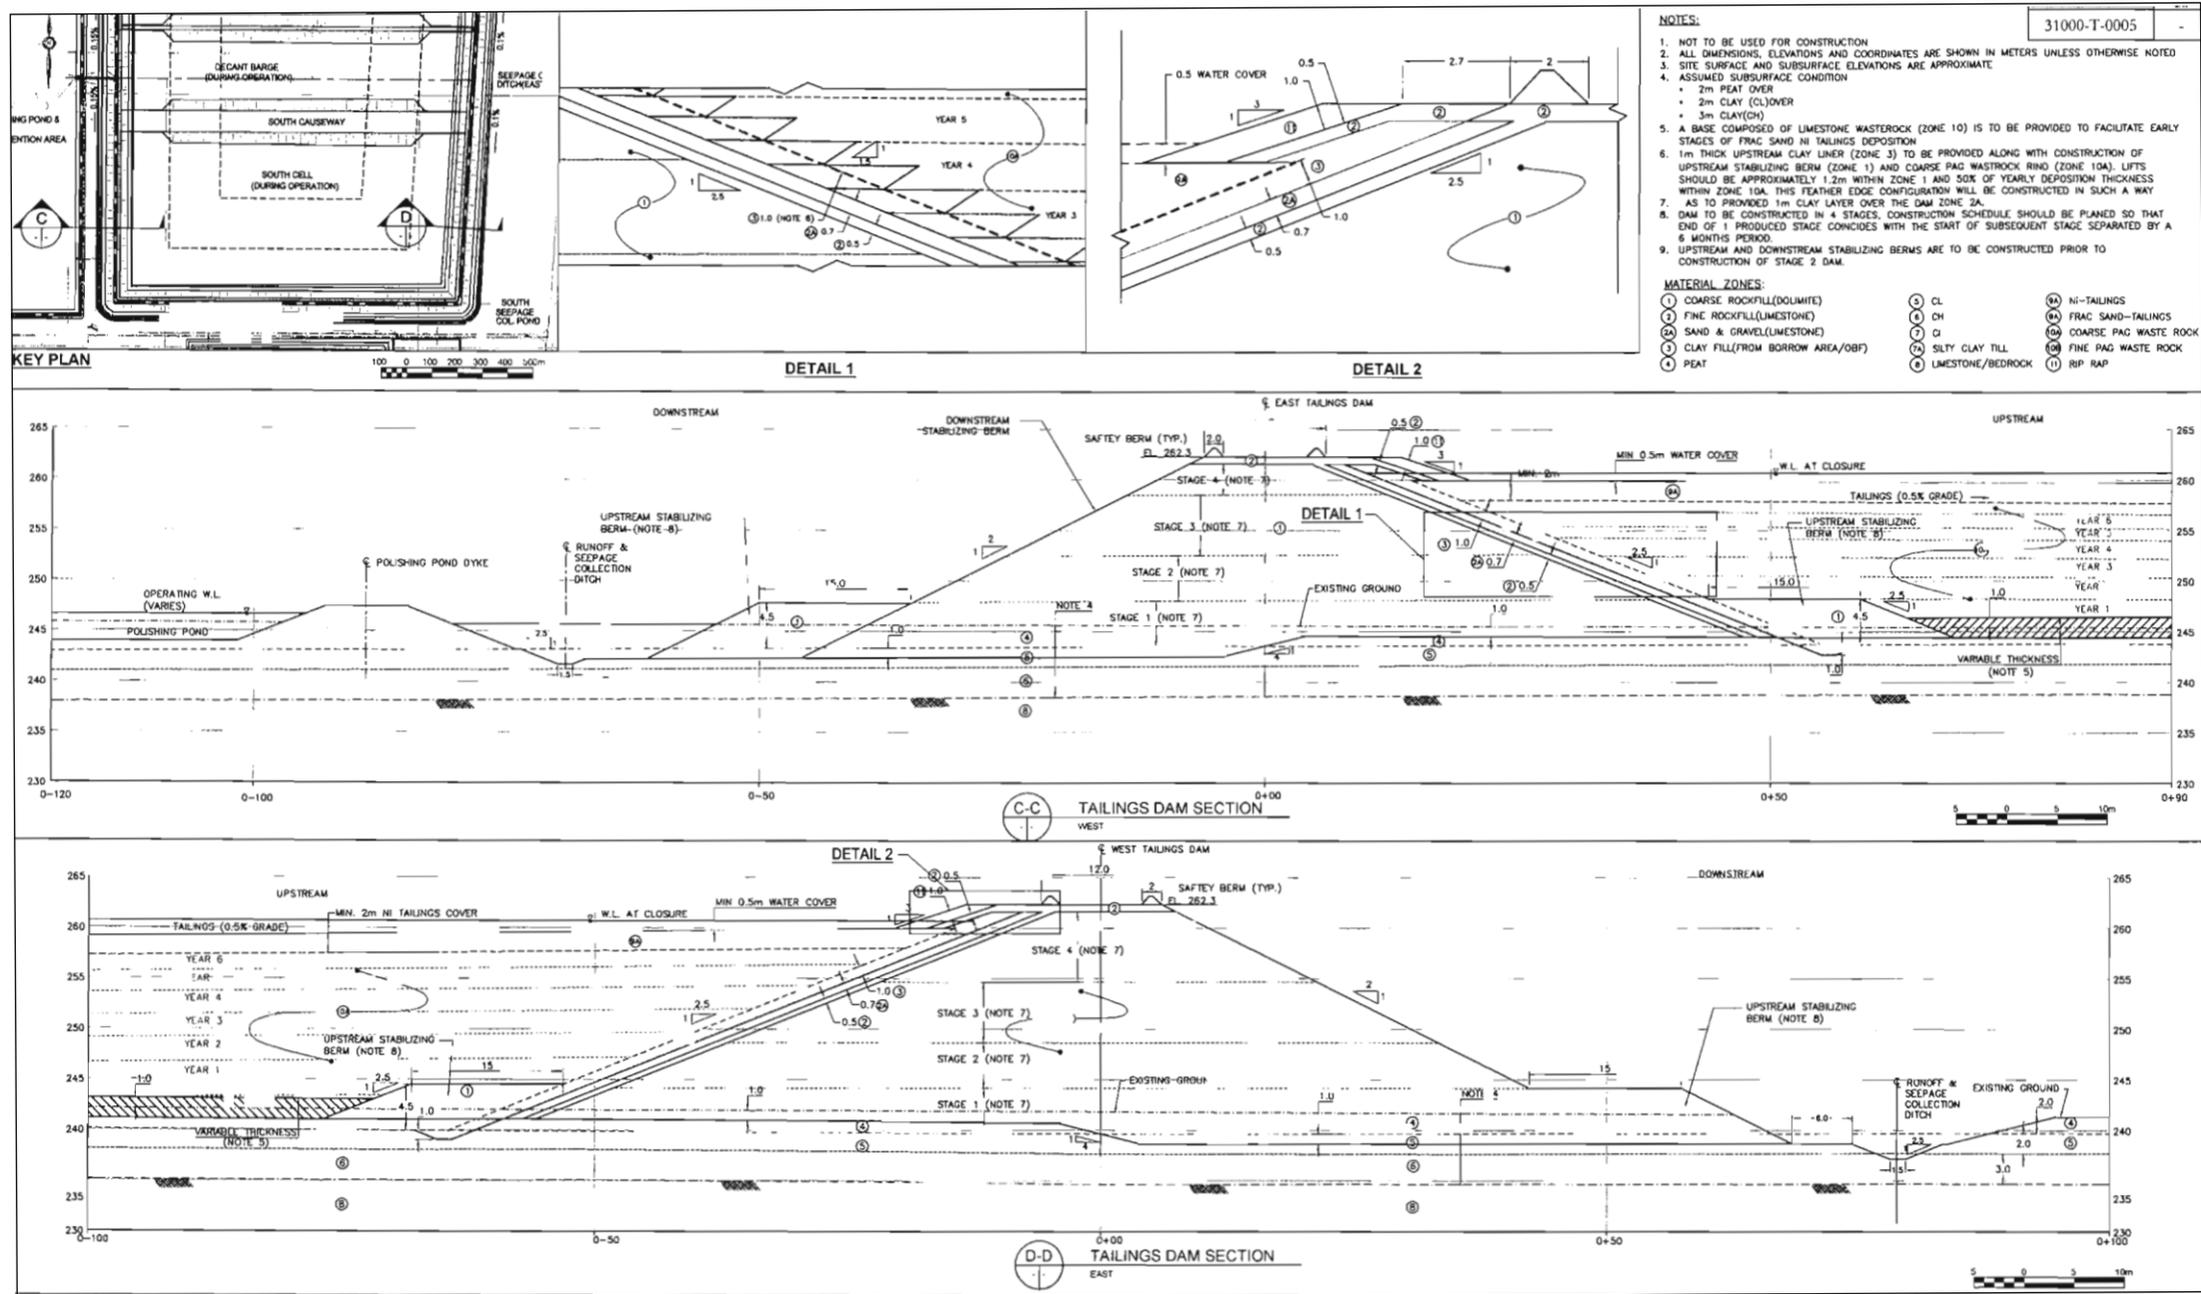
Tailings and Ultramafic Waste Rock Management Facility (TWRMF) Dam Plan and Profile
